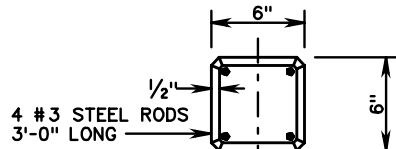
DETAIL FOR GROUNDING STEEL POST OF CHAIN LINK FENCE & HANDRAIL (HR-1)
